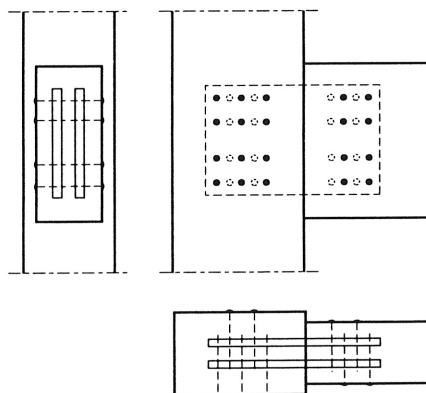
Gusset plates in slots with nails (plywood gussets) or dowels (plywood or steel gussets). The fire properties are very good.
